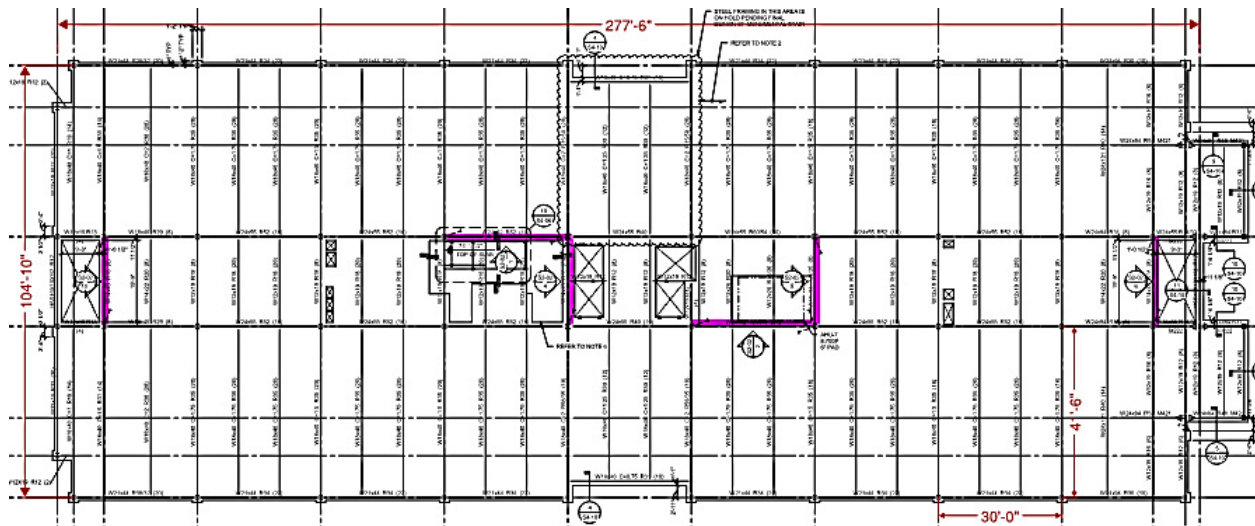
Typical floor plan with braced frame lines highlighted.
